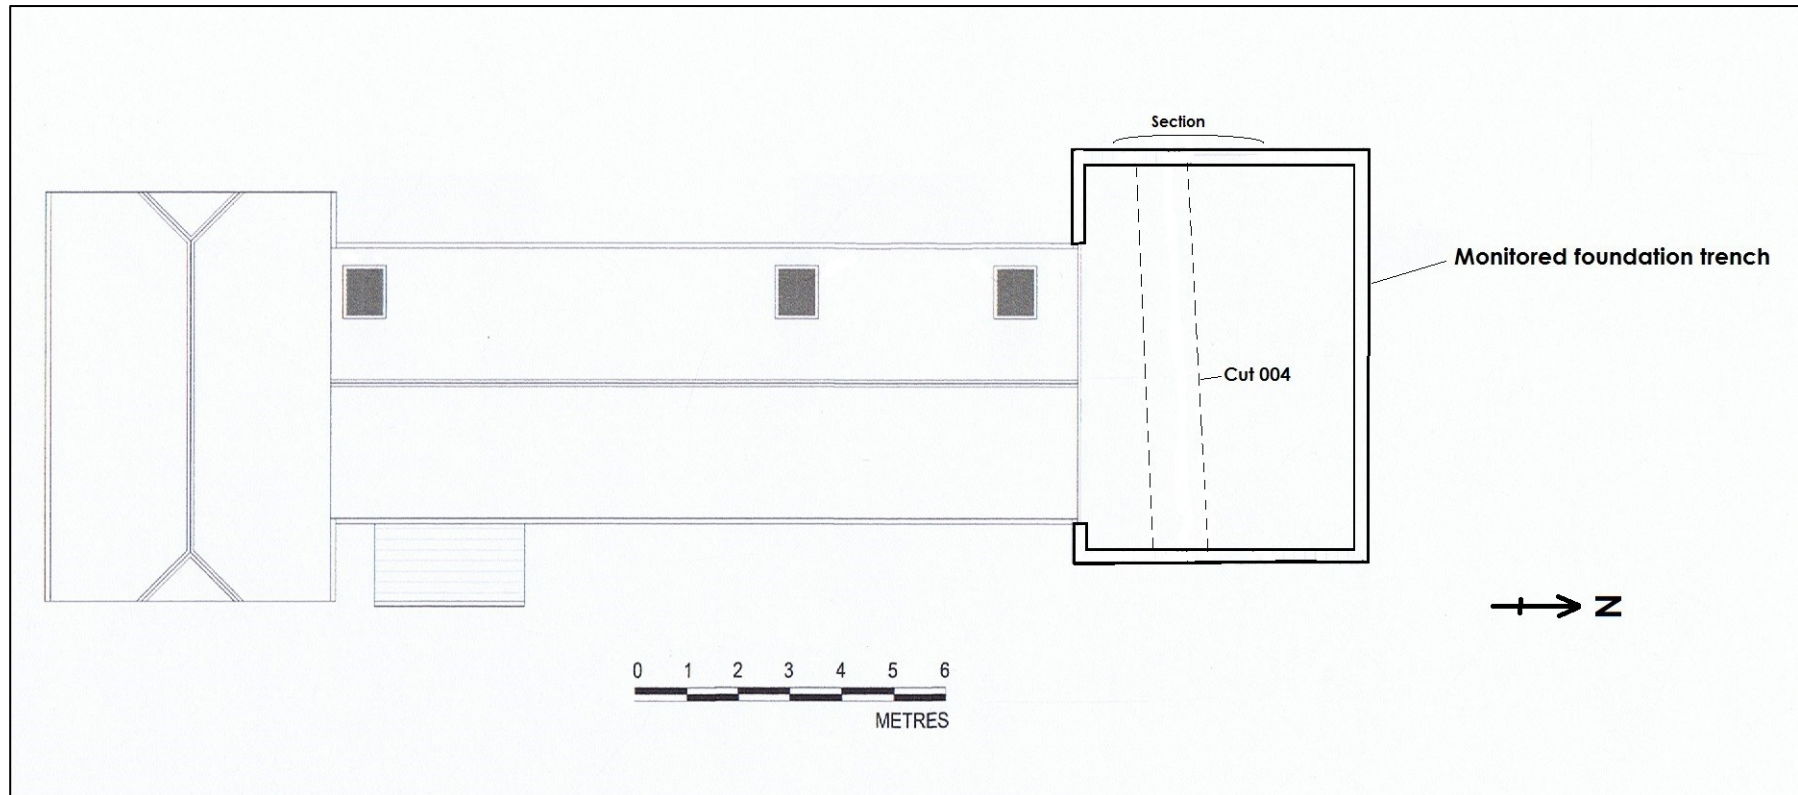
Hayreed Barn, Wilmington: Plan showing monitored foundation trenches
